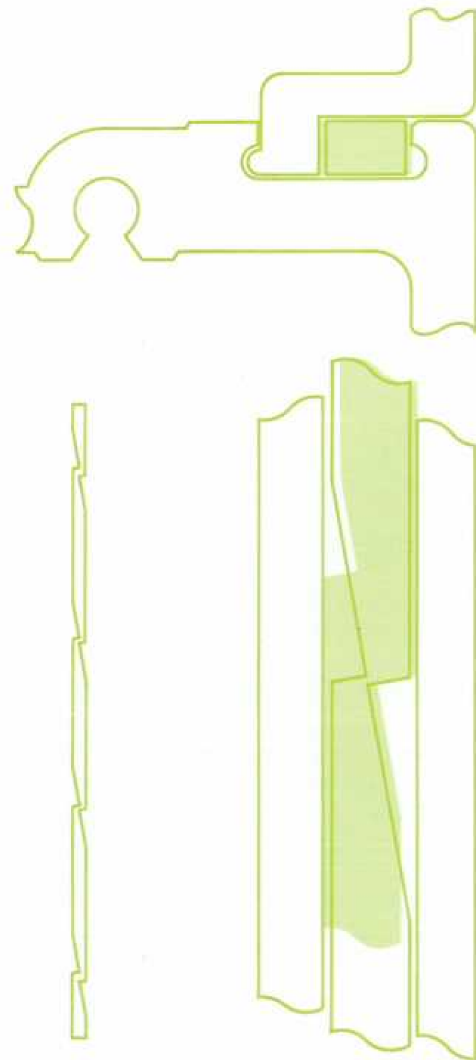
Shearing wedge seals the gaps where extrusions interlock.
